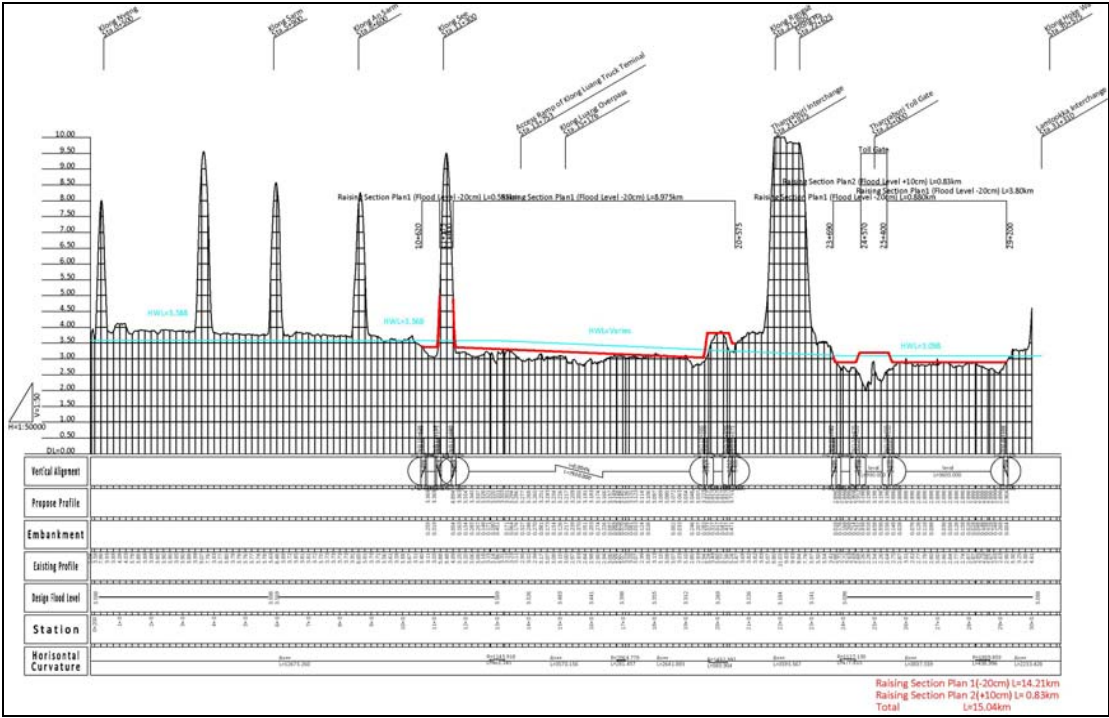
Comparison between Level of Flood and Existing Road Surface level
